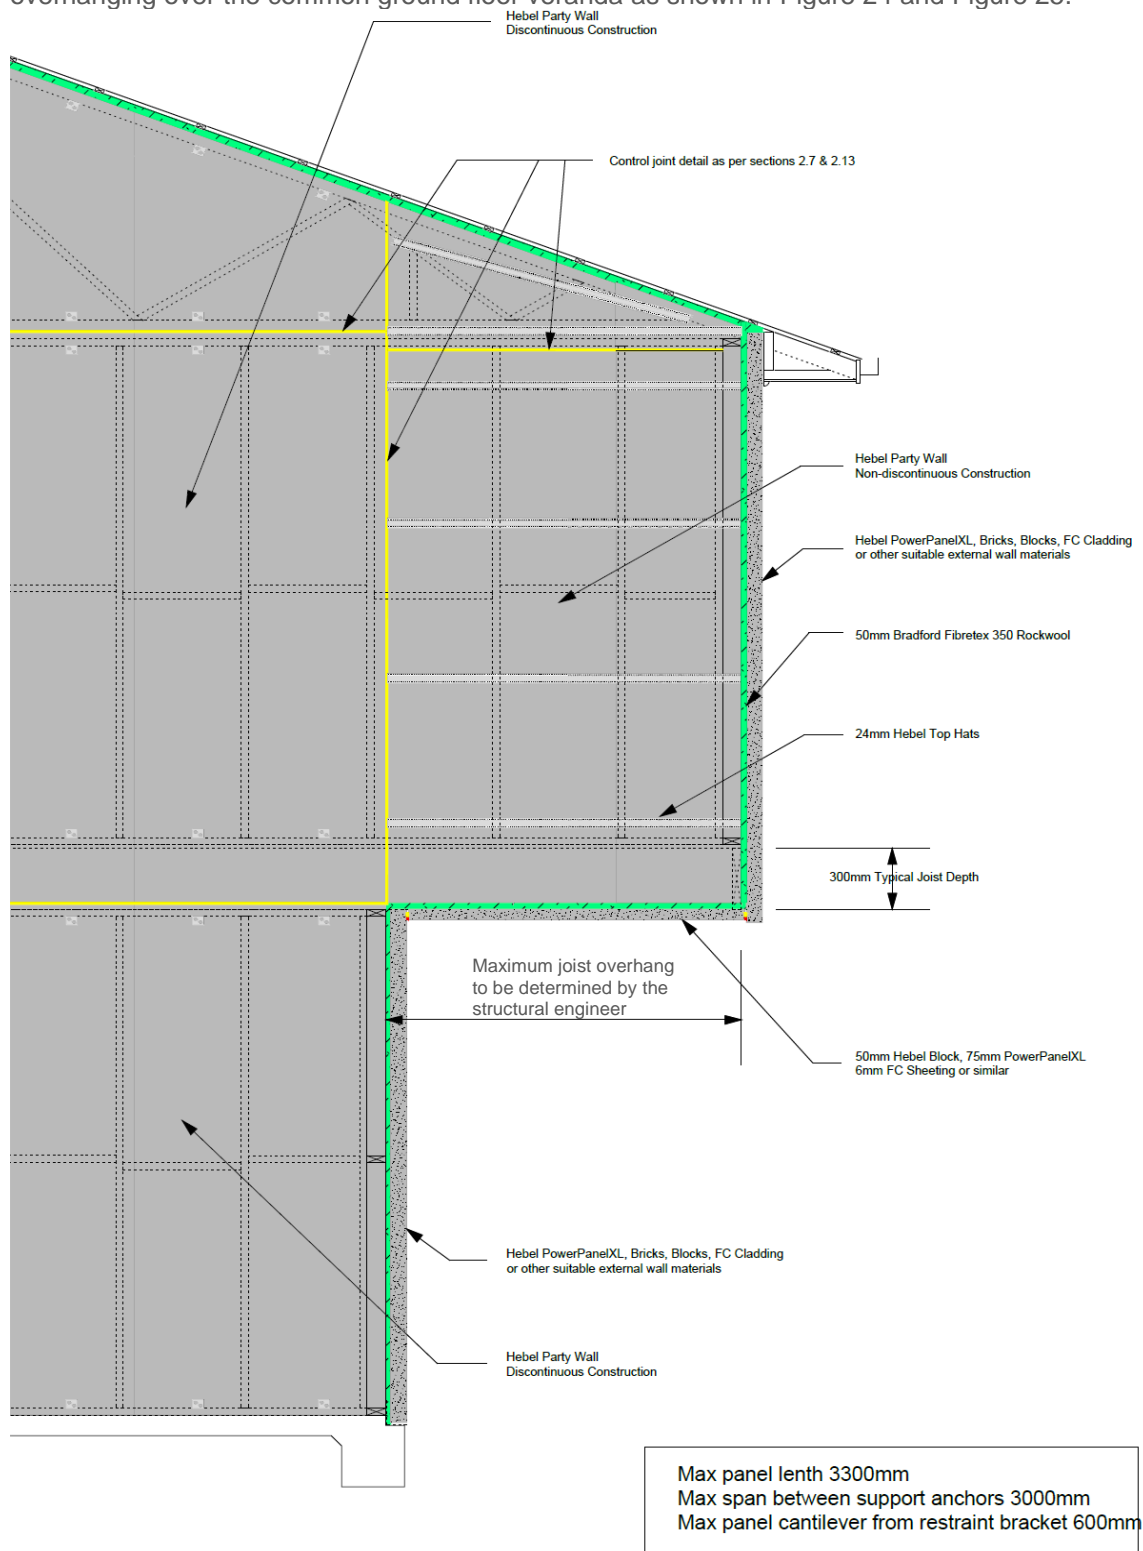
Sectional elevation of non-discontinuous Hebel party wall overhang
